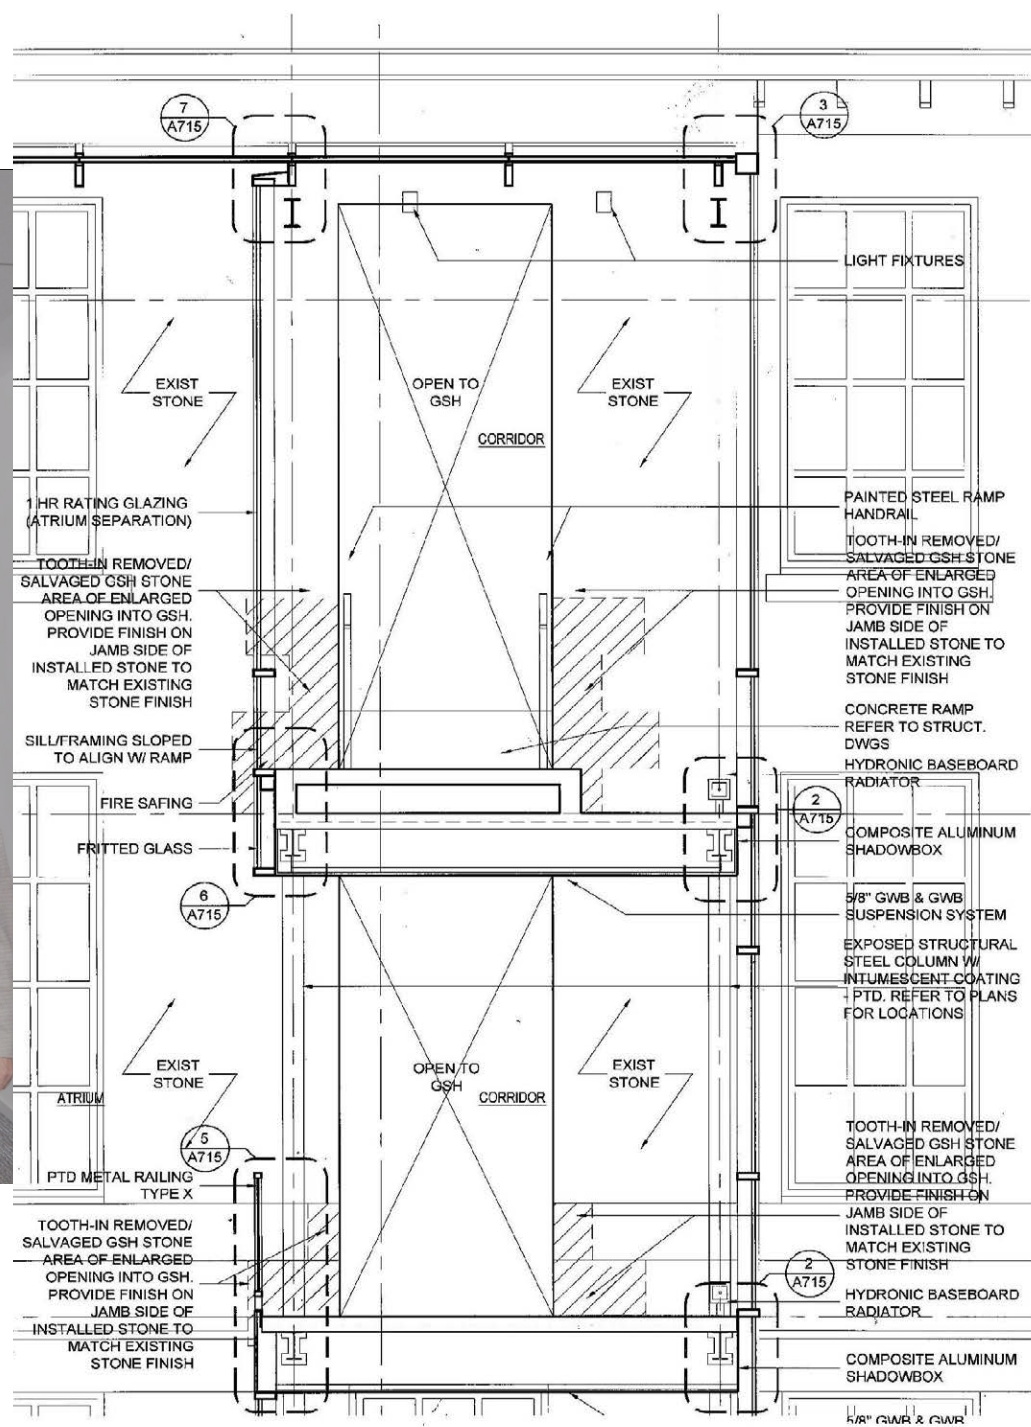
East Elevation of GSH showing connections at 1st and 2nd floors
